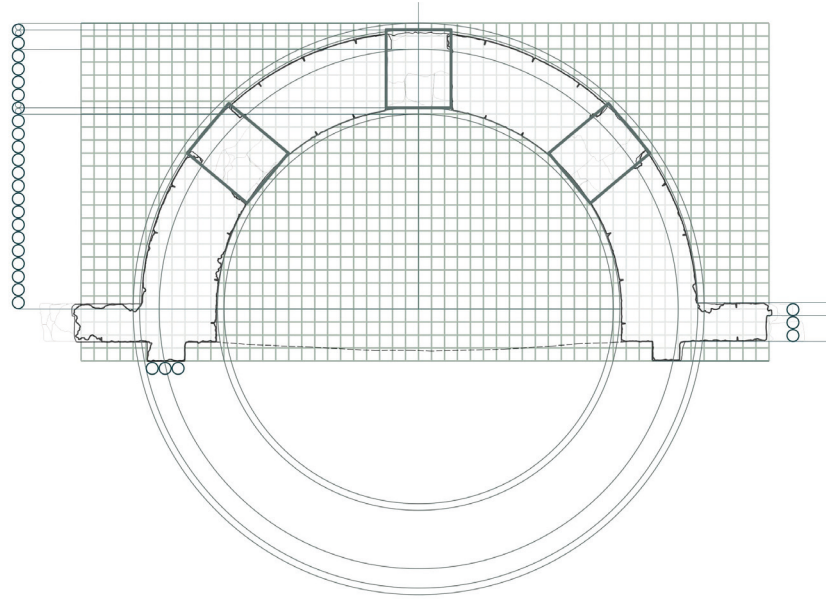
Geometric study in plan view on a grid with a module of 30.8 cm (Attic foot) (@AskGate).
